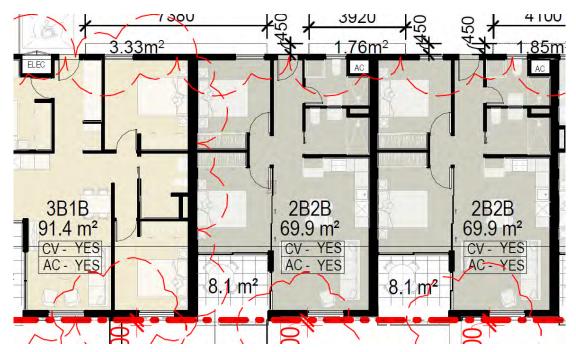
Level 1 Plan extract showing apartments in Building 1 where windows to bedrooms face either a narrow light court or corridor
